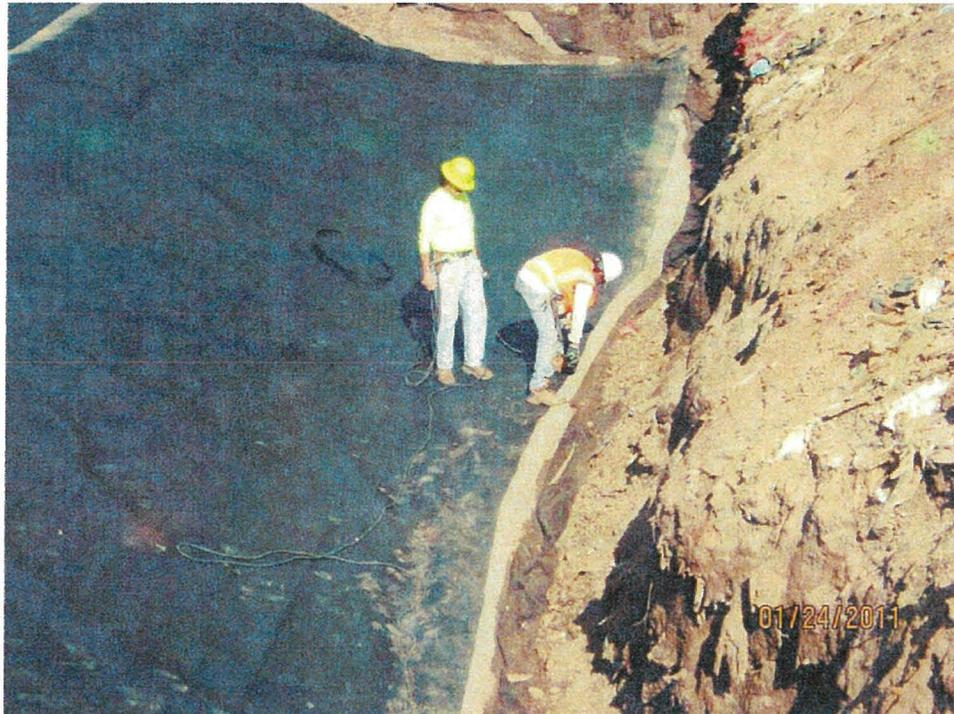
Preparation of extrusion weld to existing E4 60-mil geomembrane, looking northeast.
